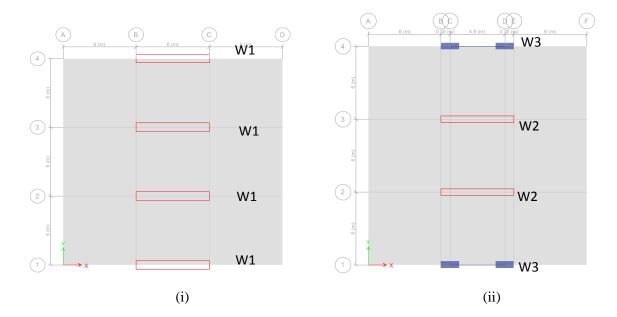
(i)Structural plan of four equal shear walls W1 for model(1) - (ii)Structural plan of two equal shear walls W2 and two equal modified shear walls with truss or frame system W3.
